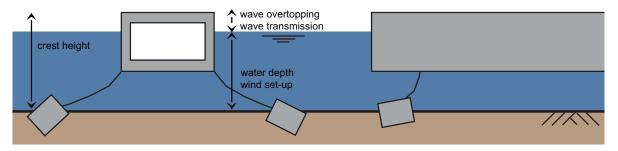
Cross-sectional View (left) and Side View (right) of Floating Breakwater
